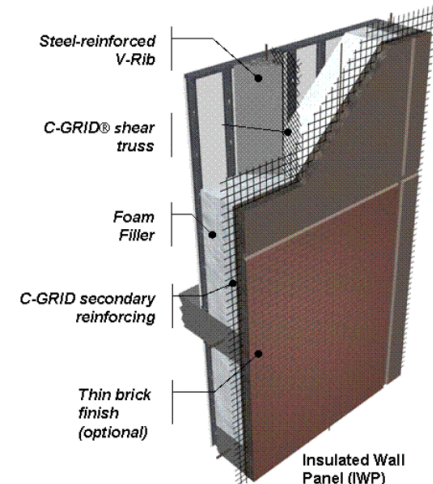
CarbonCast® Architectural Insulated Wall Panels. Image courtesy of High Concrete
